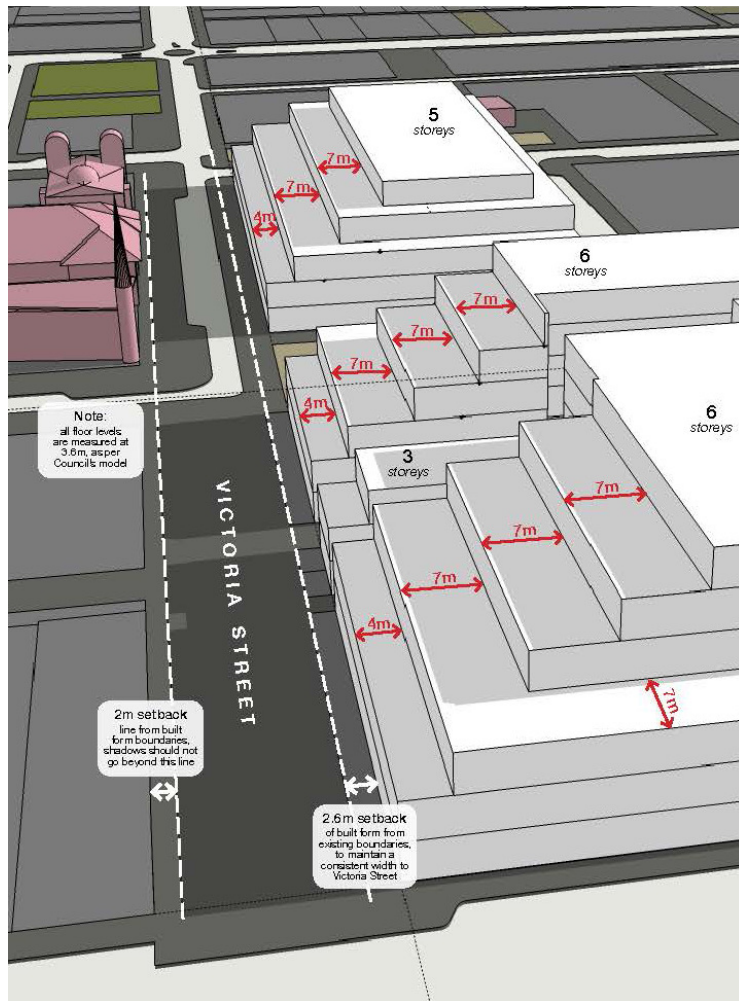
Same view of Victoria Street looking west with dimensions for modified built form profiles, to achieve the requirement for sunlight to the southern footpath (no overshadowing within 2m of southern building line, 12-2pm, 21 June).
